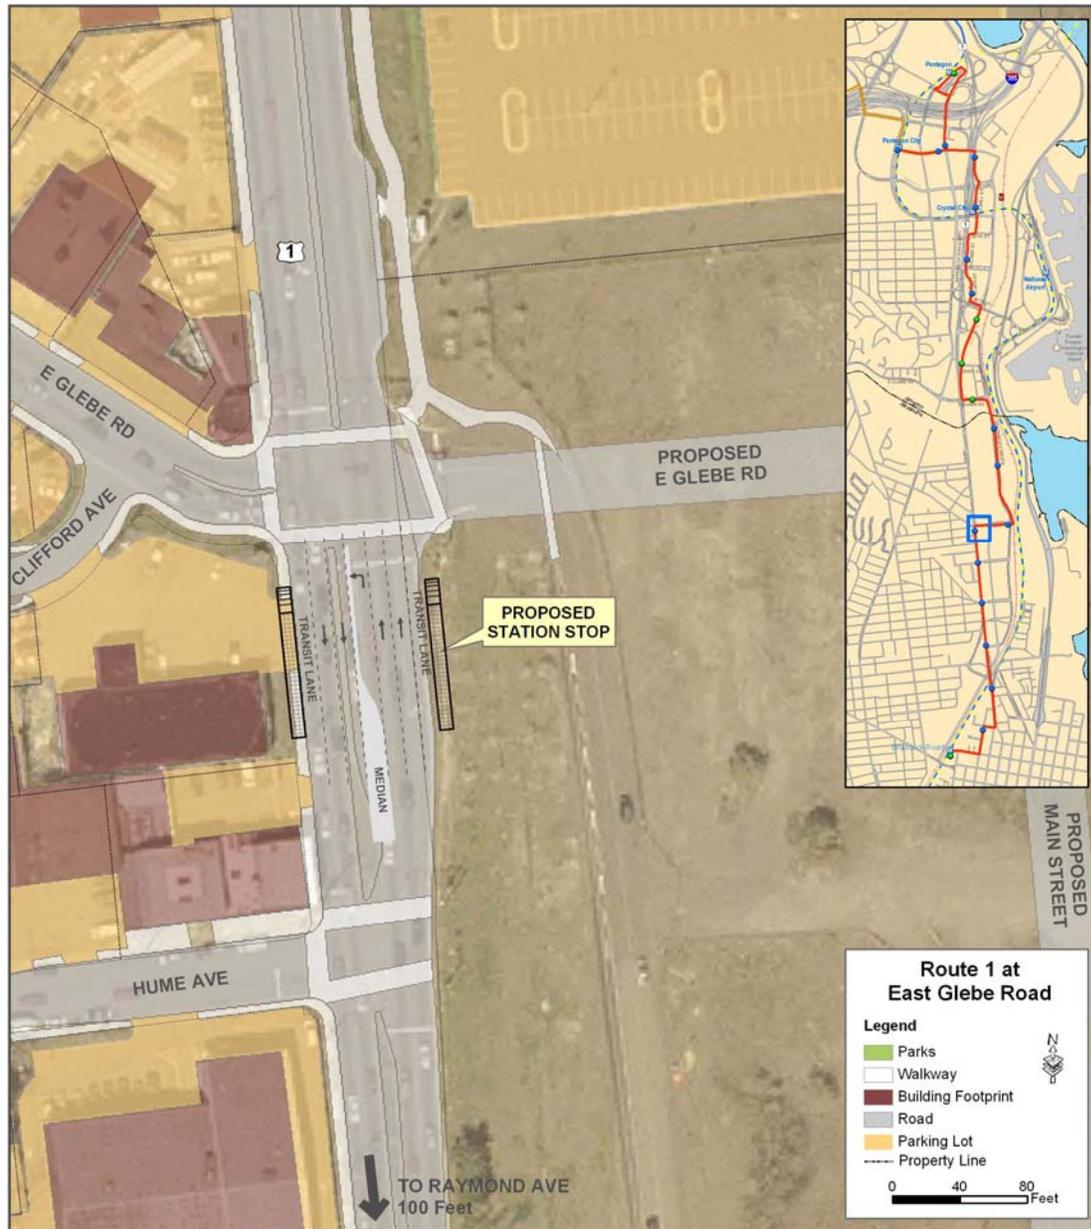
(see Fig. 22): Route 1 at East Glebe Road (Curbside Transitway)
